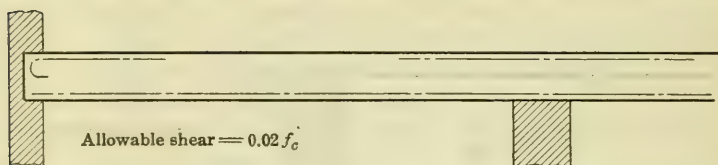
TYPICAL REINFORCED CONCRETE BEAM; PRINCIPAL LONGITUDINAL BARS NOT ANCHORED.
